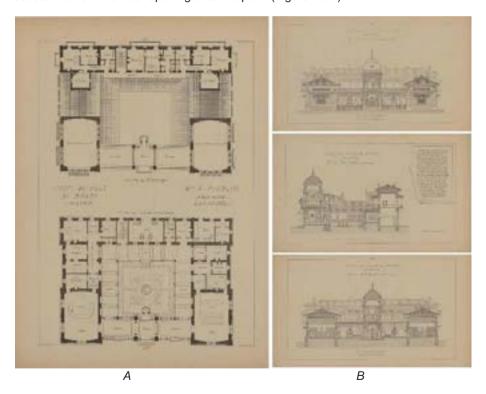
Graphic drawings of the city hall of Biskra: A) plans of the ground and first floor; B) above, the main façade, and below, two sections [56].
